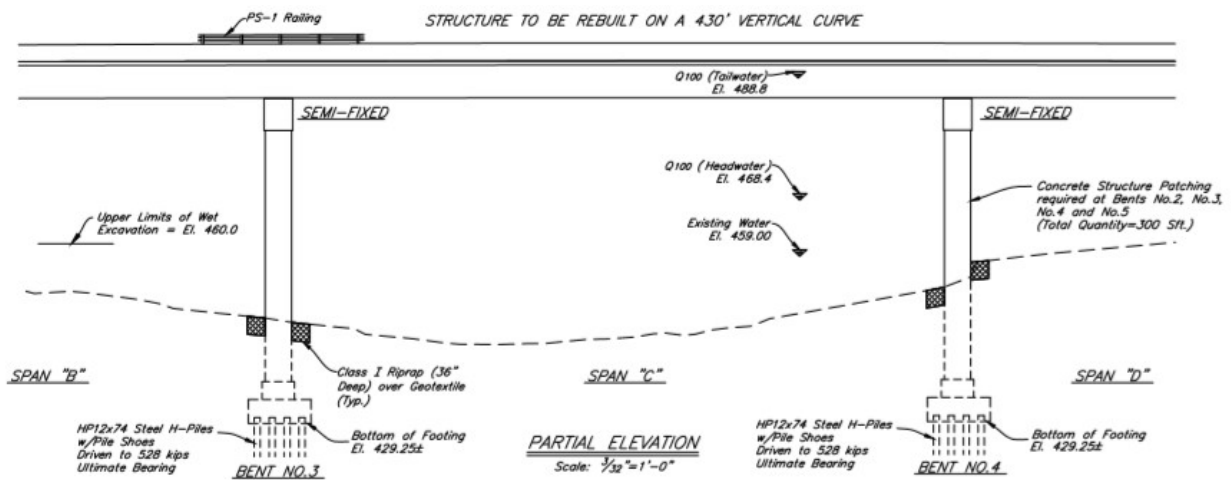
Elevation View of the Bridge—Span 2, 3, and 4 (NBI 18790) (2014)
